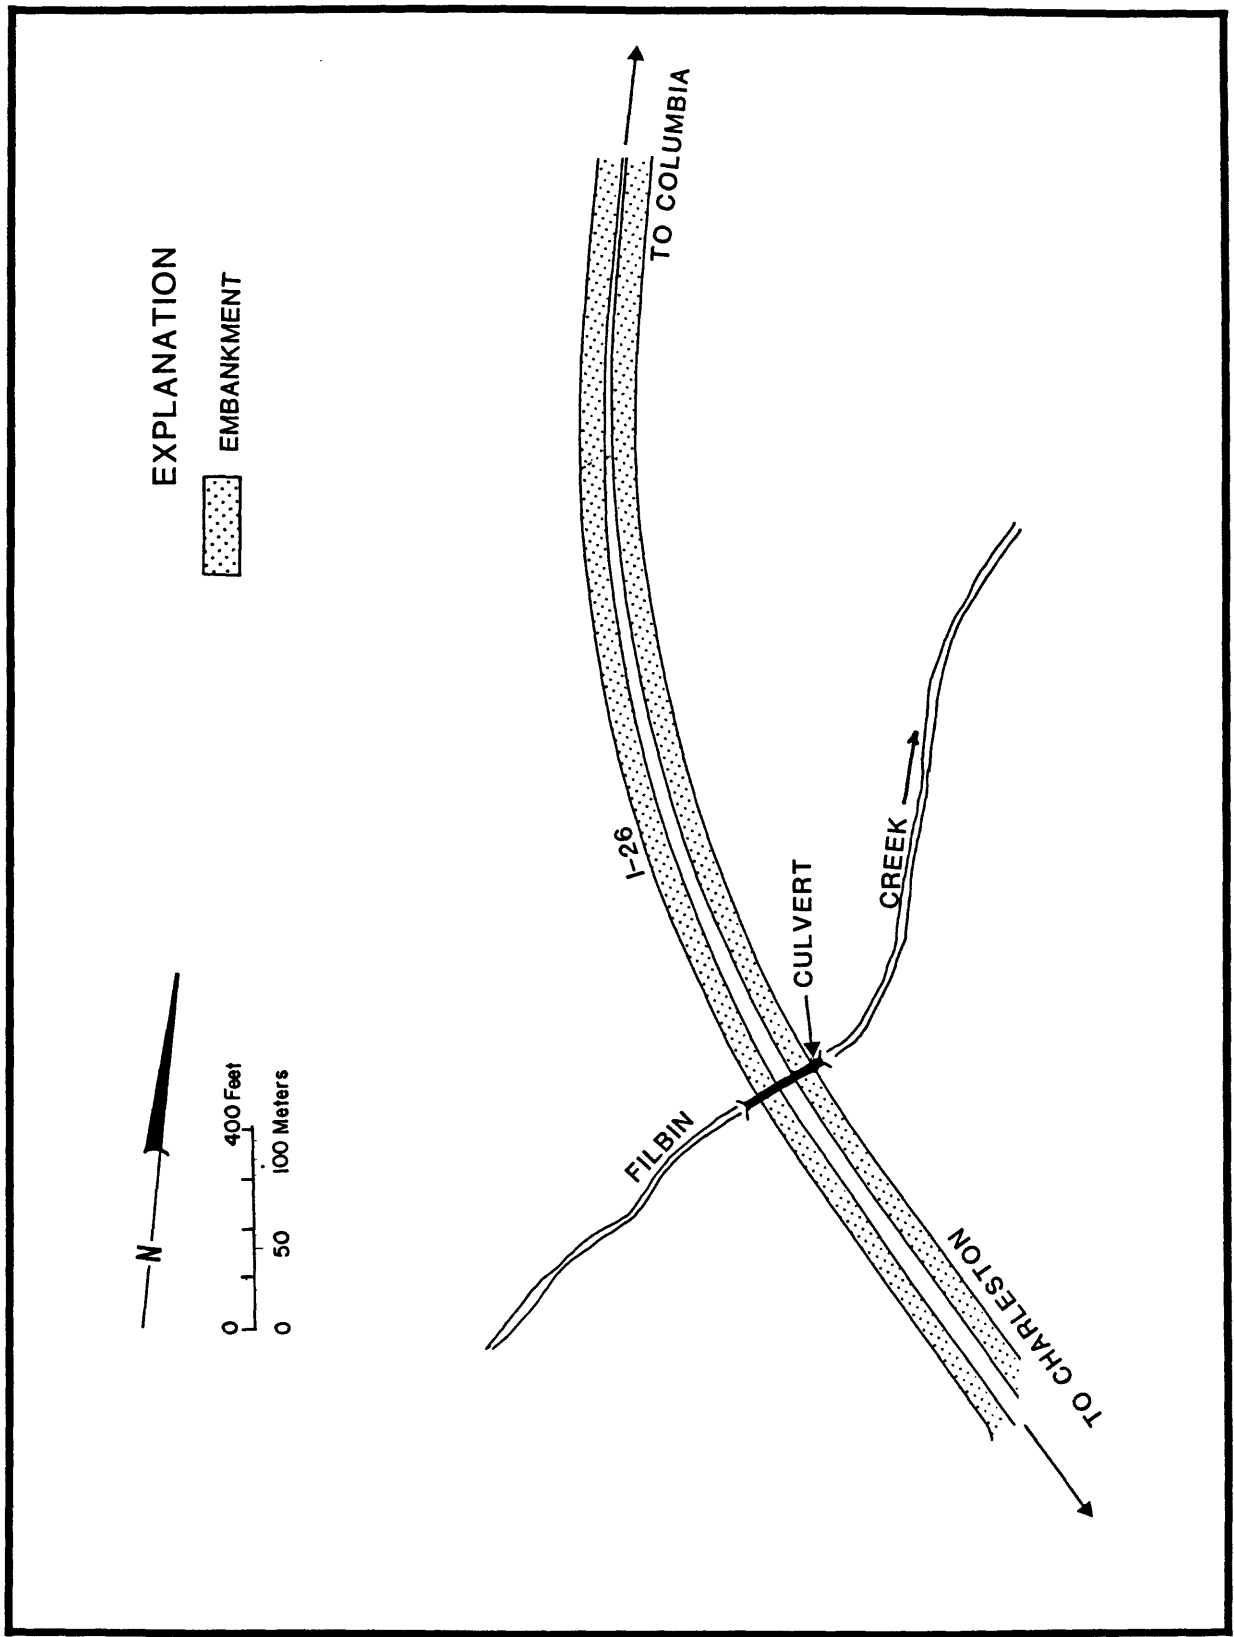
Filbin Creek at proposed I-26/I-526 interchange, existing conditions.
